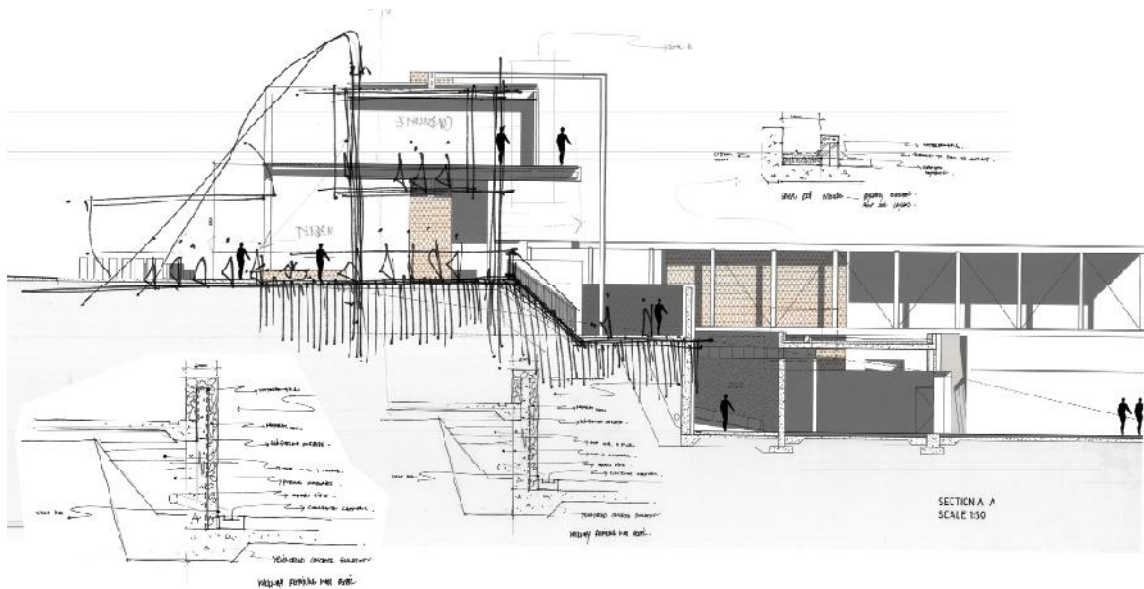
Section development of Consulate meeting rooms defining street edge and connecting to the informal market space.
